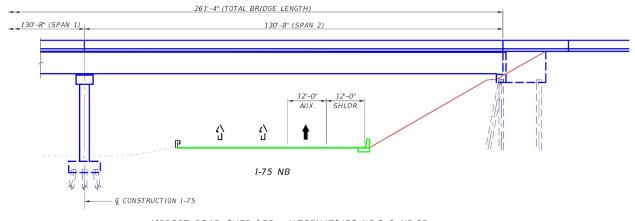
Proposed Roadway Work under Airport Road Bridge - Alternative NB-2B
